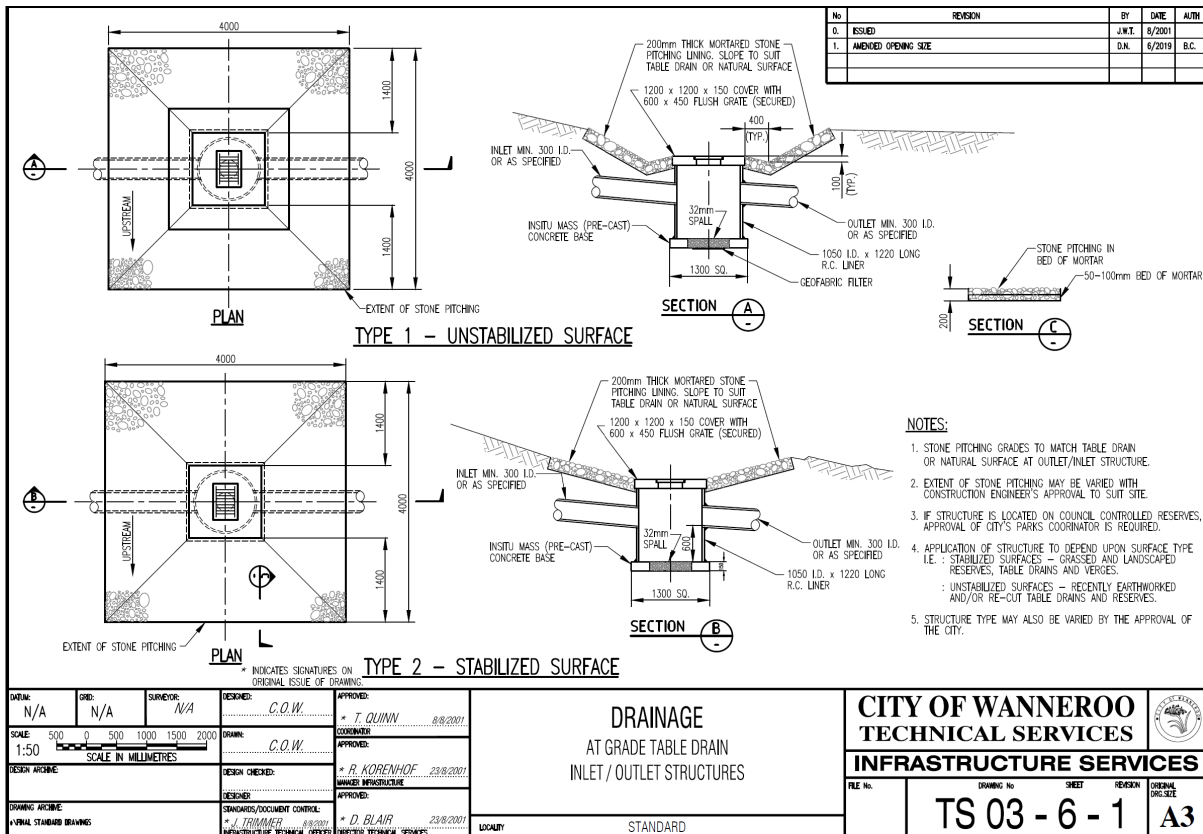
Stormwater Drainage Structures - Bubble Inlet Pits in Graded Table Drains (City of Wanneroo)
